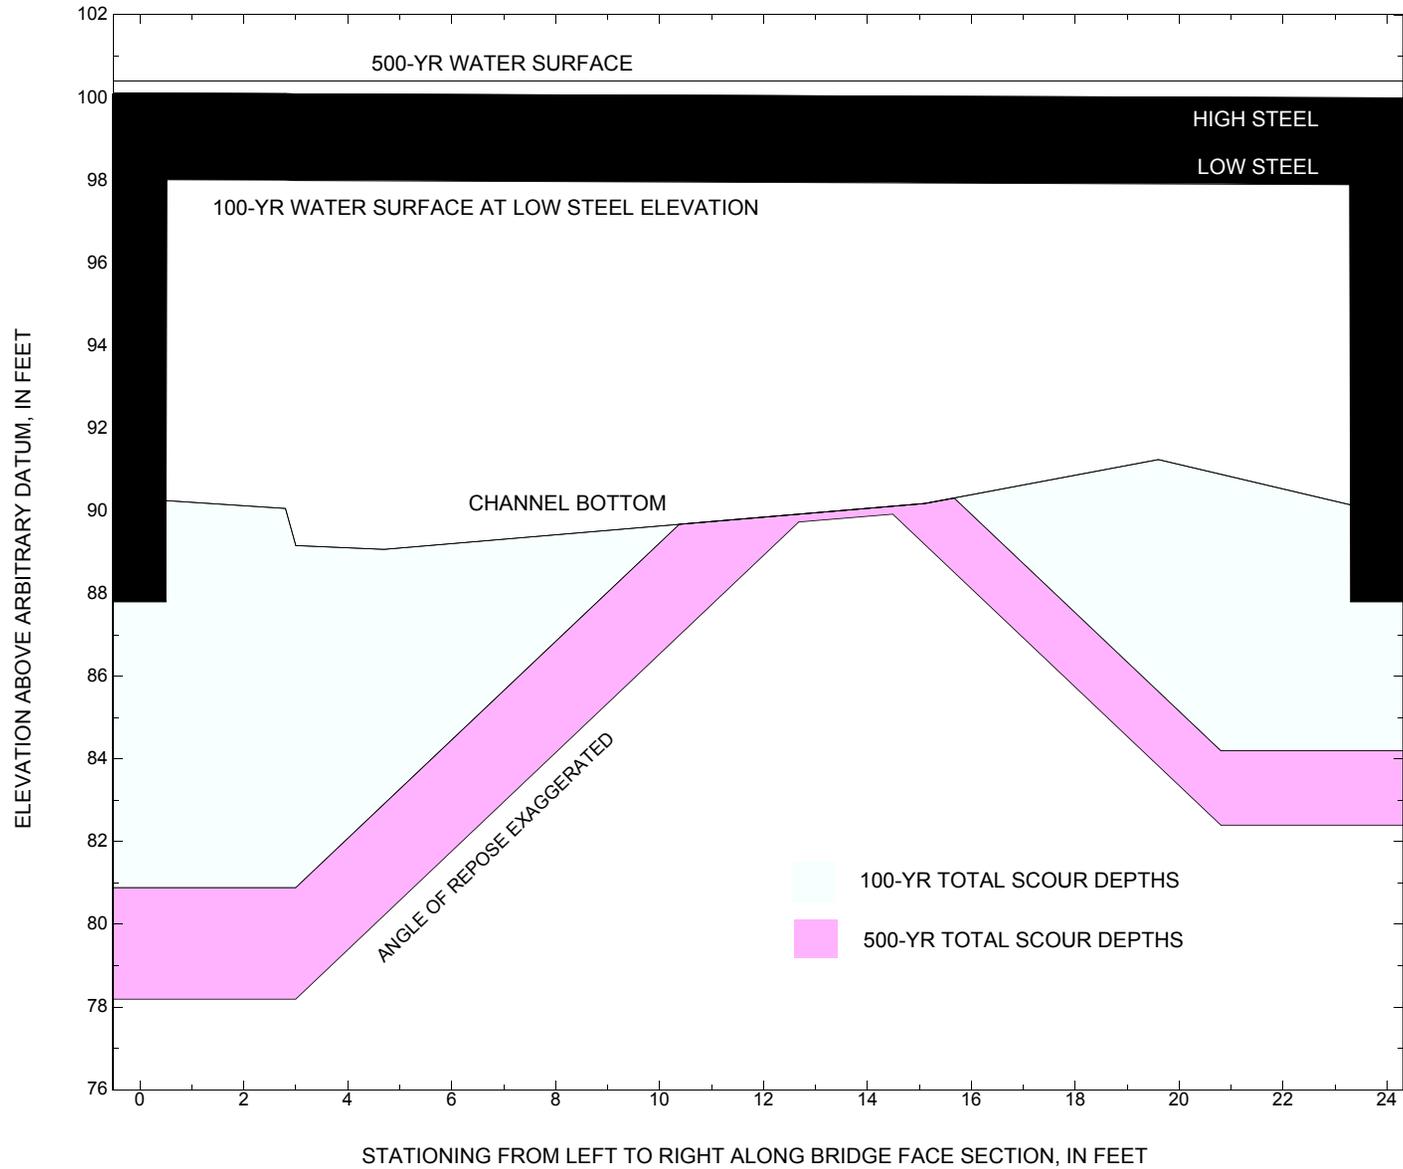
Scour elevations for the 100-yr and 500-yr discharges at structure BRIDTH00050032 on town highway 5, crossing the North Branch Ottaquechee River, Bridgewater, Vermont.
